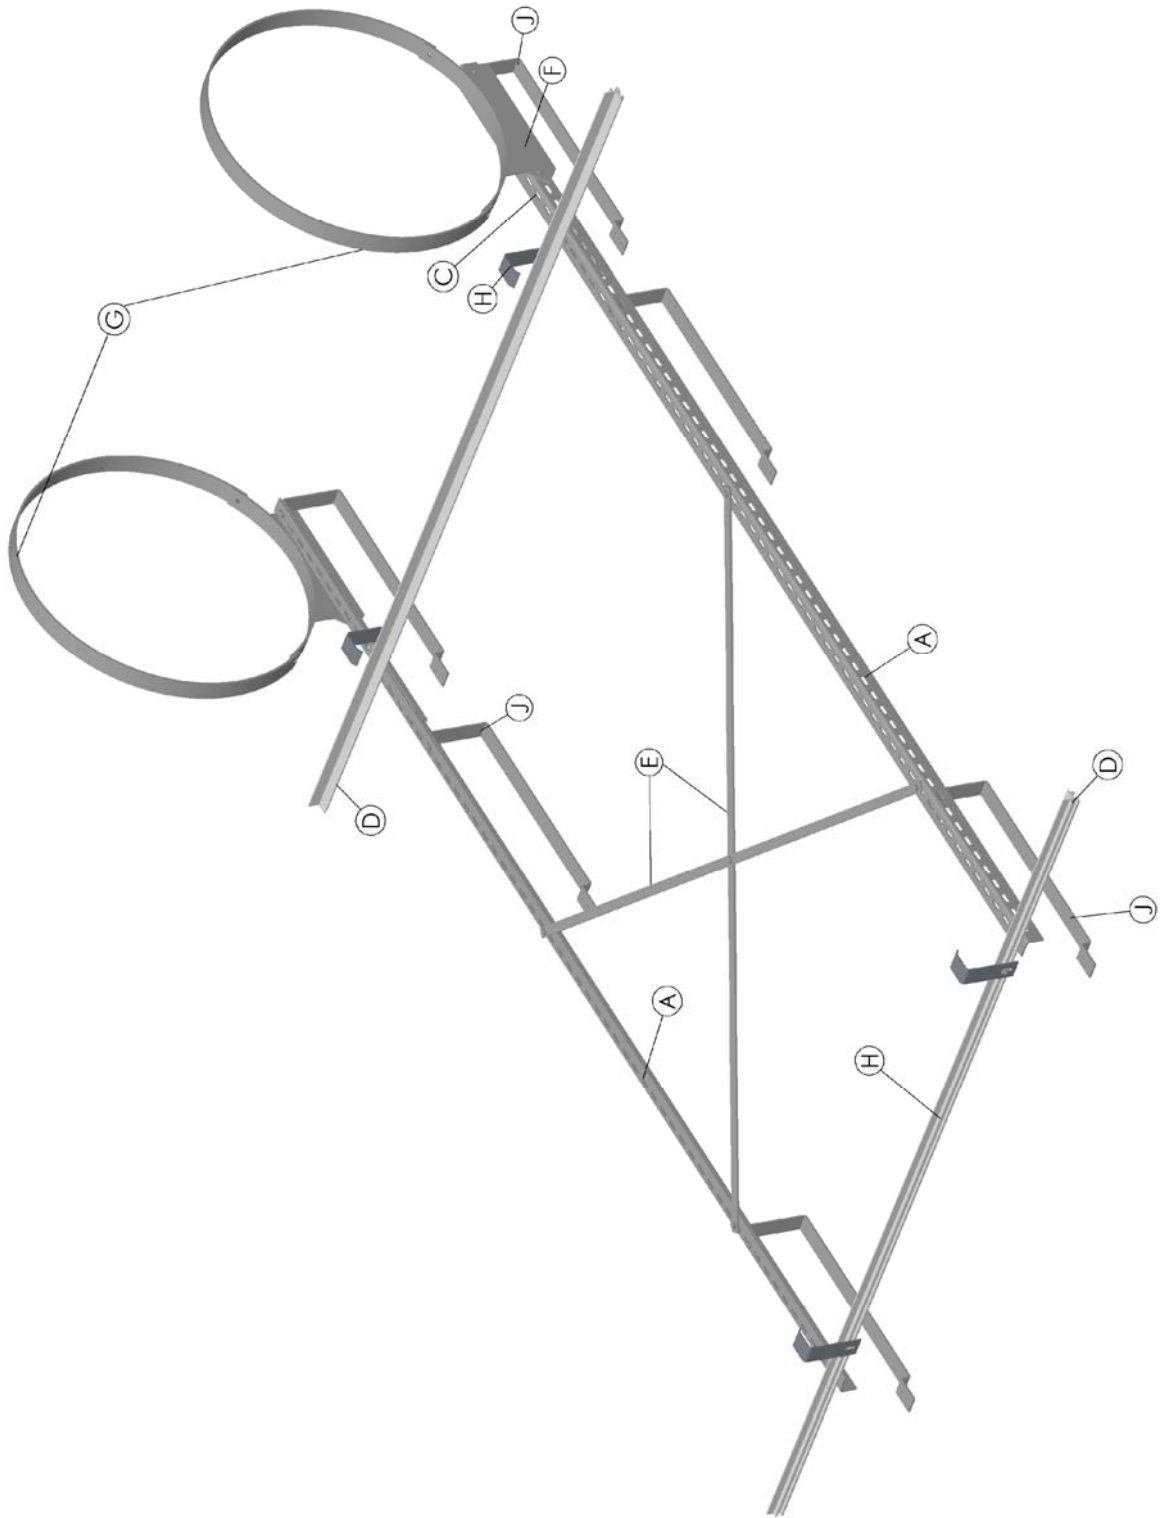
FIGURE E: Connection Details for Inclined Roof Assembly – Using C45
